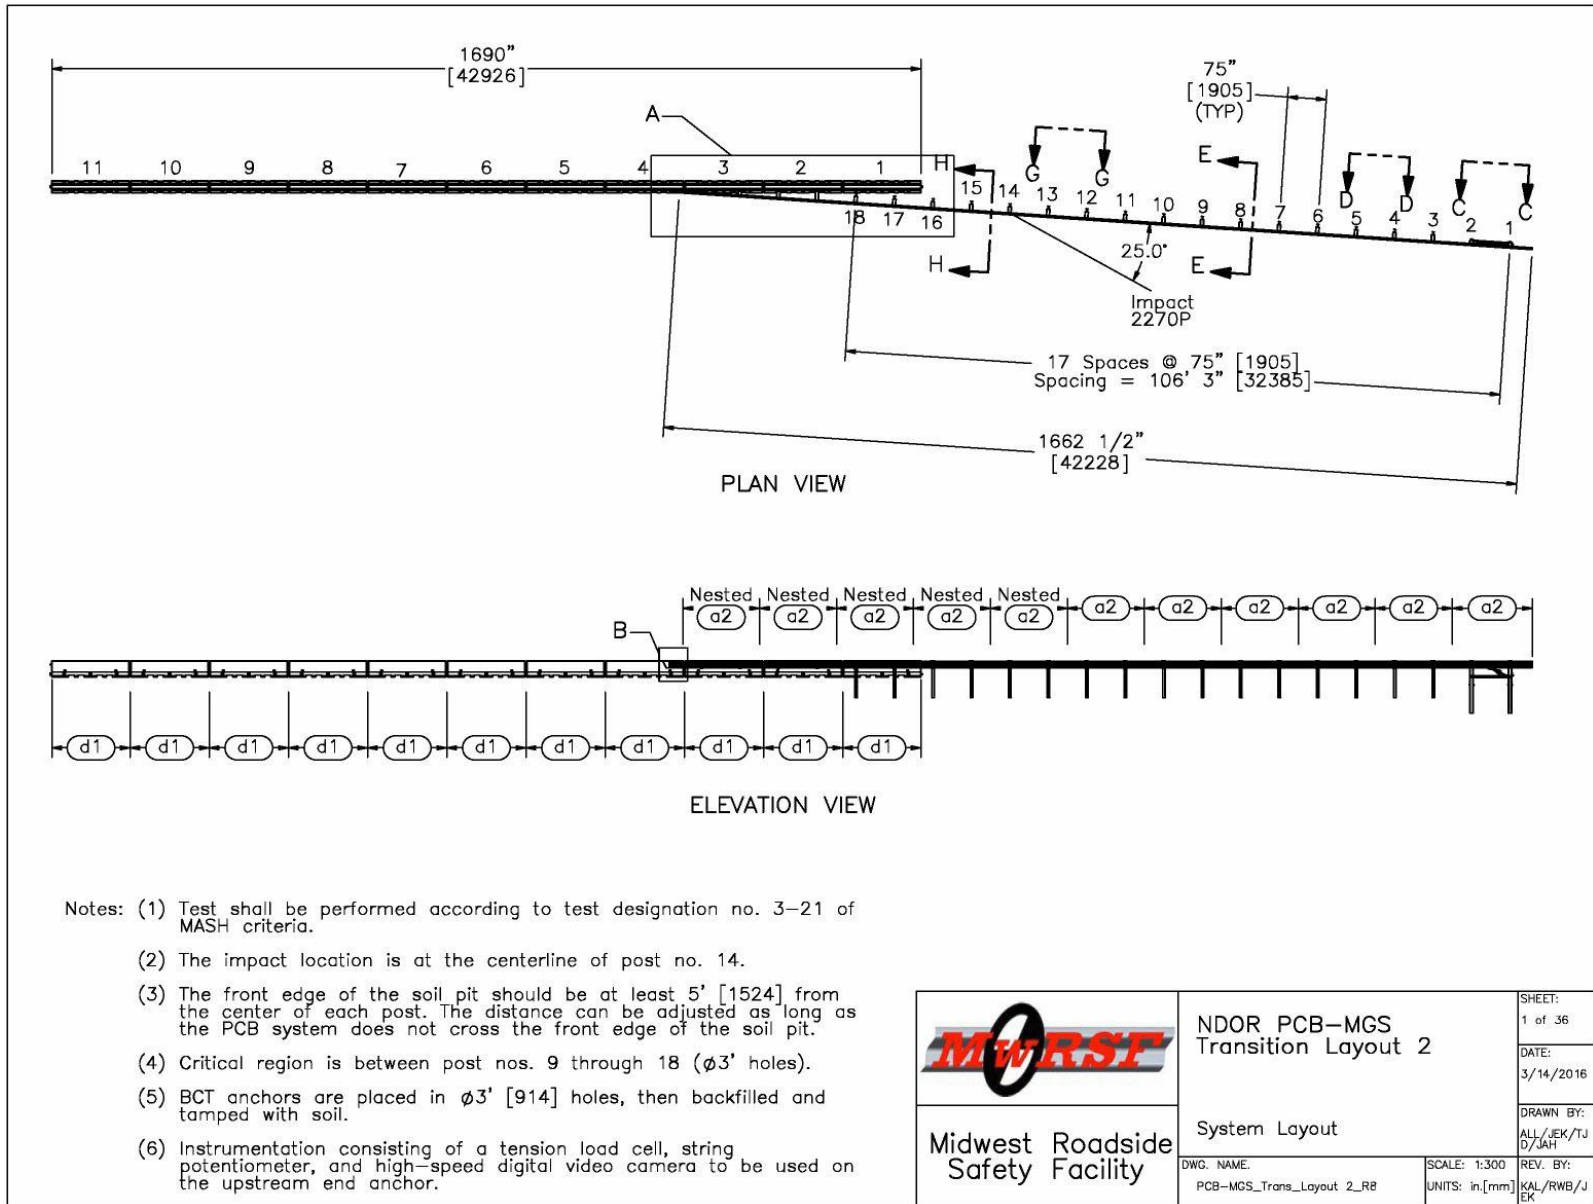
Test Installation Layout, Test No. MGSPCB-1
